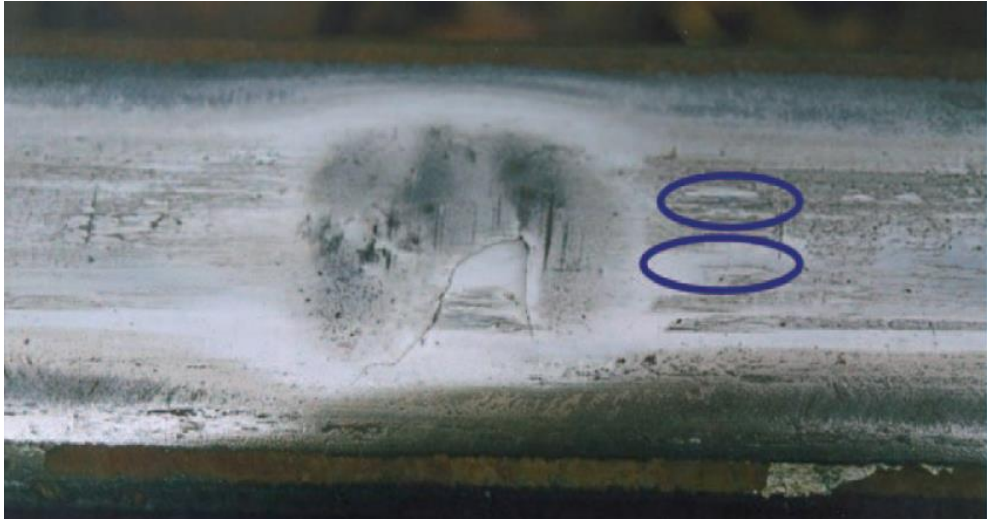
Squat type defect with an appearance of V-shaped surface breaking crack. Material such as that shown ringed appears to be WEL [3].
